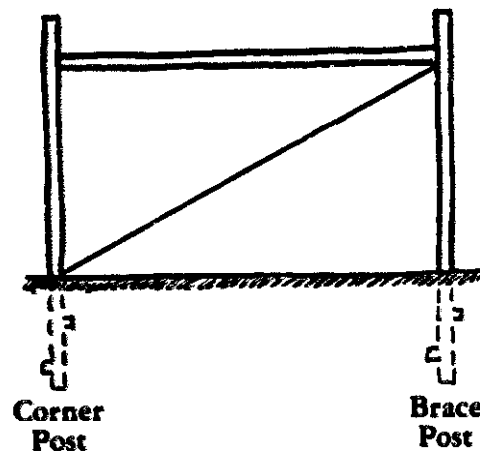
Bracing a corner post with a horizontal strut, a tie, and cleats.
